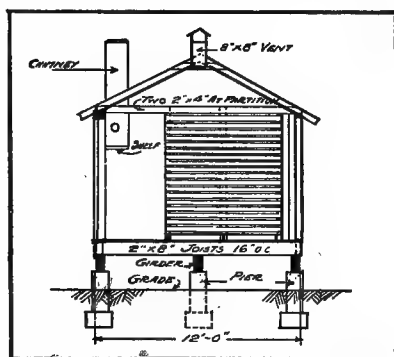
Cross-section of a small sweet potato storage-house (12 x 16 feet).
